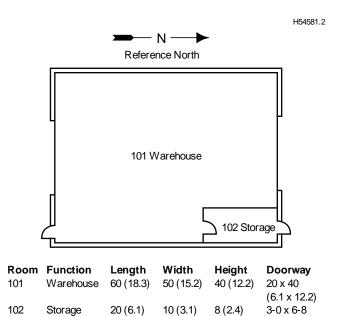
Building 5 Detailed Floor Plan, Astrotech
